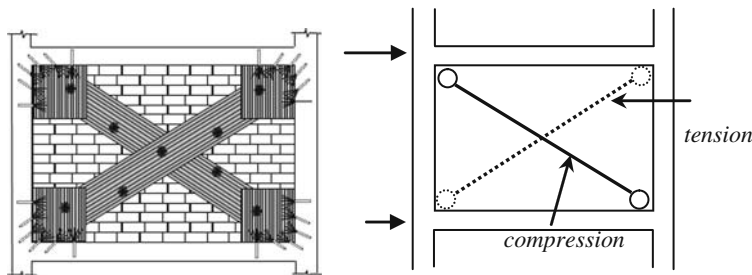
Application and modeling of CFRP retrofitted infill wall
